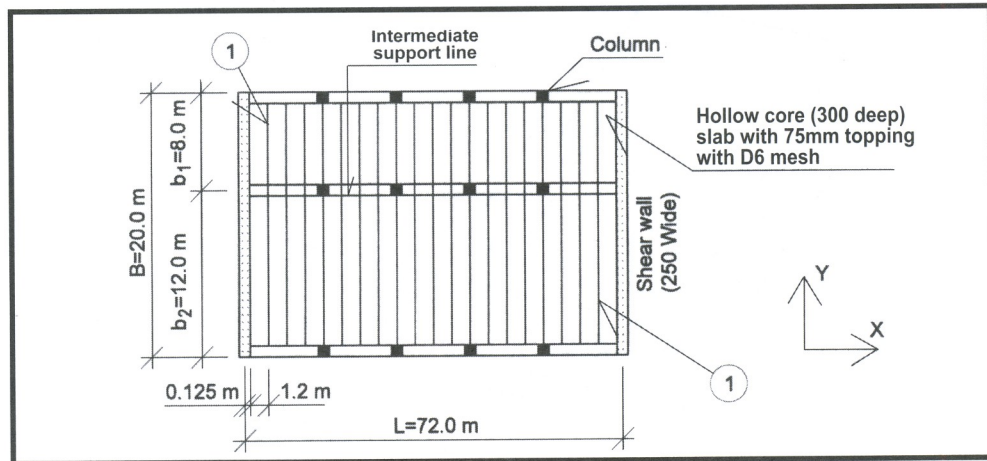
Examples Of Shear Transfer Along Longitudinal Joint Between Elements In Floor Diaphragm Design
